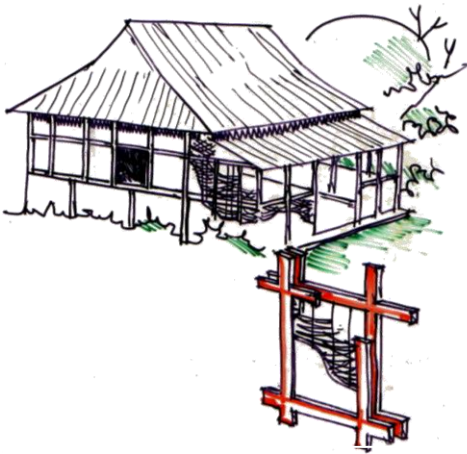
Typical Assam house (Wattle & daub, bamboo lathe infill walls)
